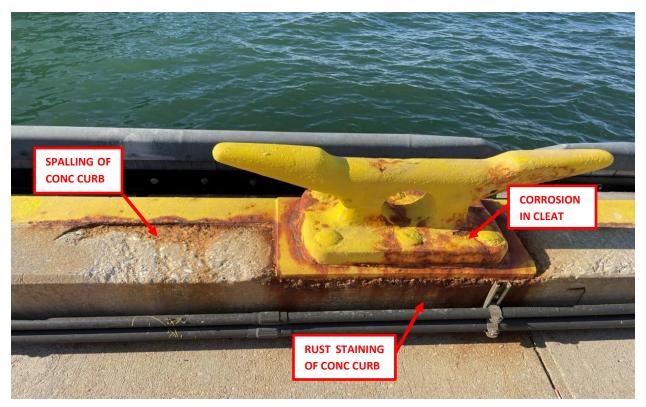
Typical condition of mooring cleat. Also note spalling of conc curb
